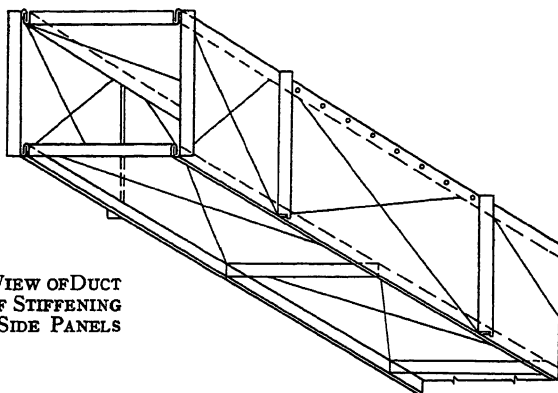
ISOMETRIC VIEW OF DUCT SHOWING LOCATION OF STIFFENING SEAMS ON TOP AND SIDE PANELS OF DUCT
